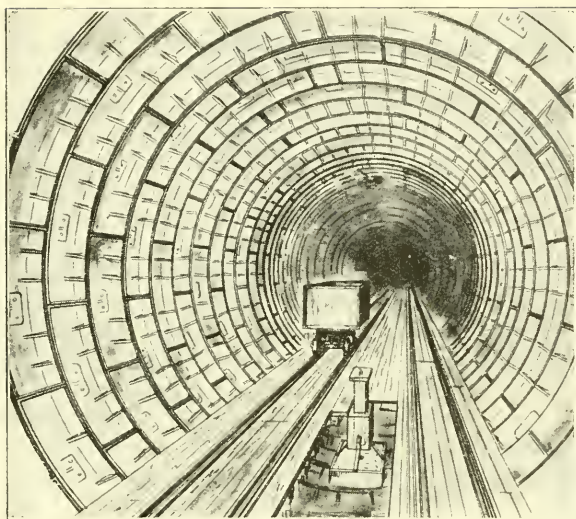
TELESCOPING STATION MARK IN FLOOR OF TUNNEL.
